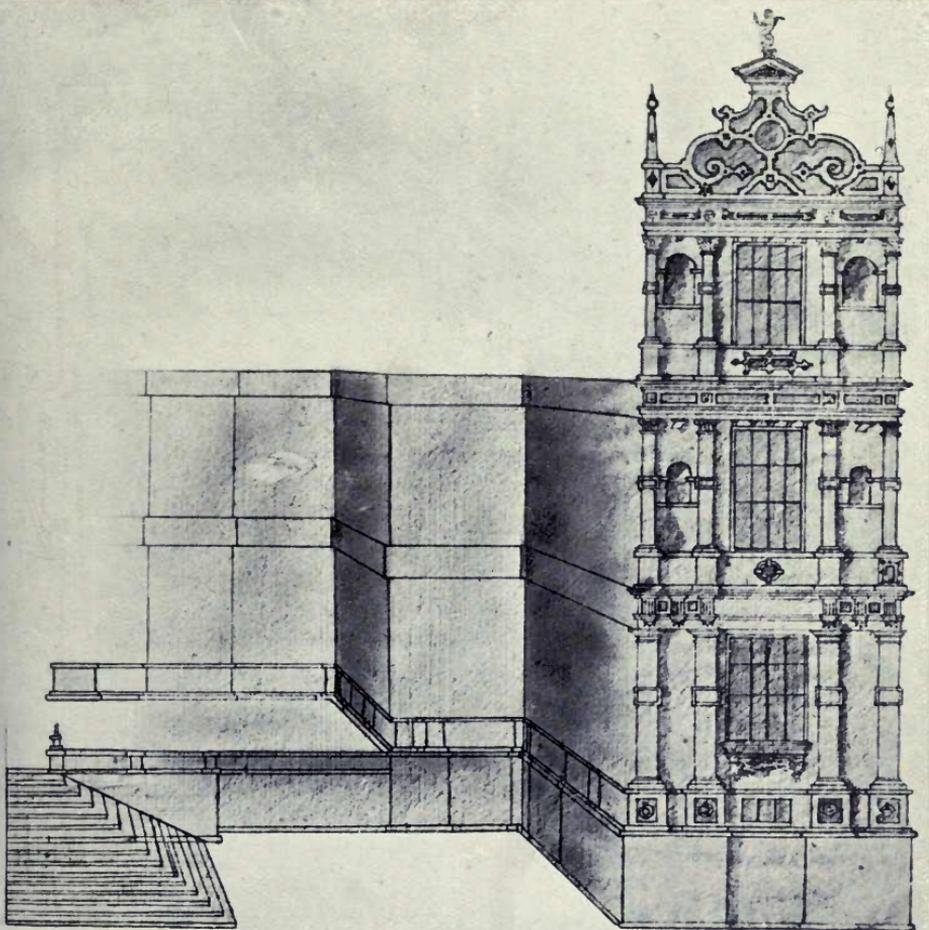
WOLLATON HALL : ELEVATION OF CORNER PAVILION, BY SMITHSON.
